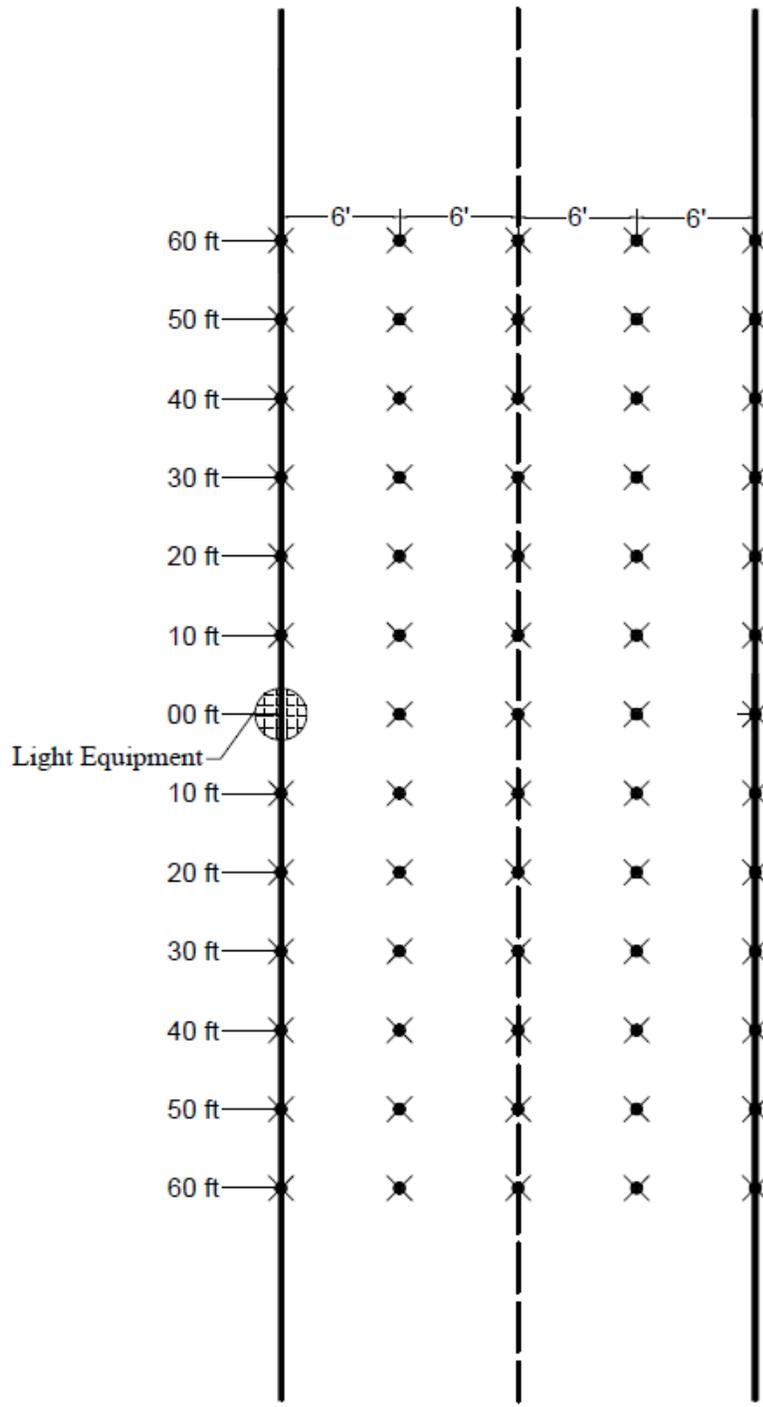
Plan View of Roadway showing Grid Layout for Light Measurements
